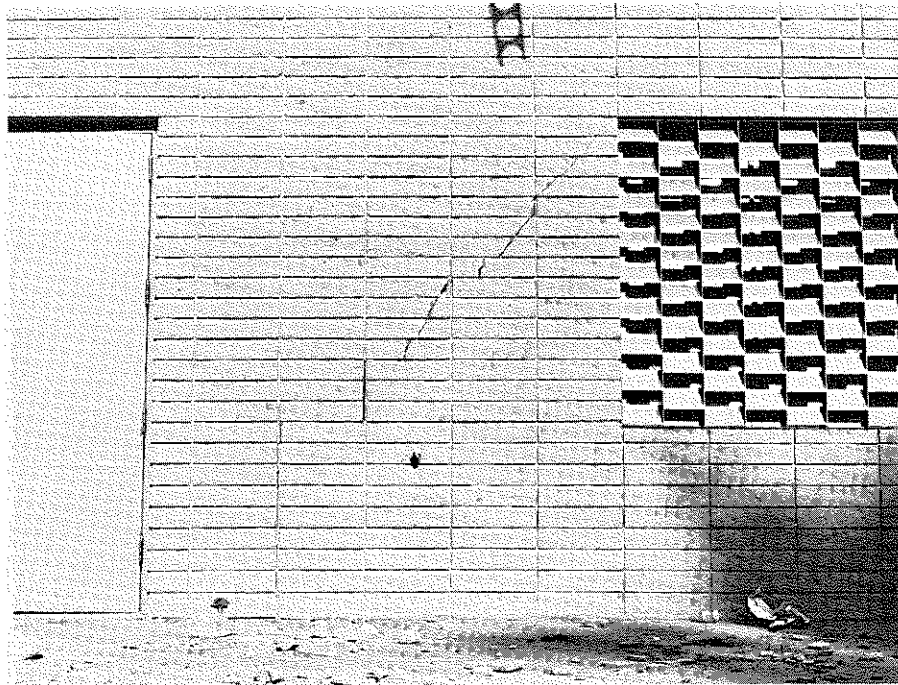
Crack in west wall of power plant building at Olive View Hospital. A similar crack, though smaller, occurred in the east wall.
